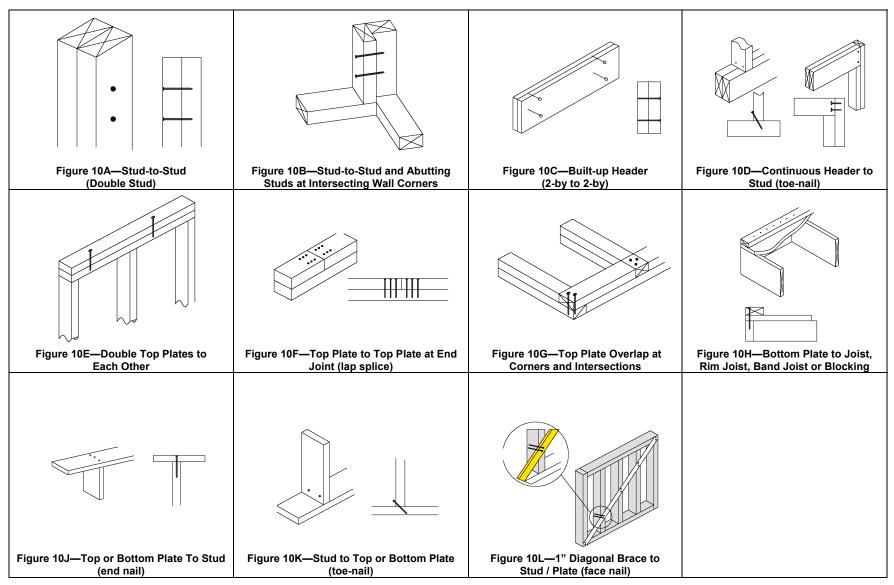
PRESCRIPTIVE FASTENING DETAILS - WALL FRAMING
